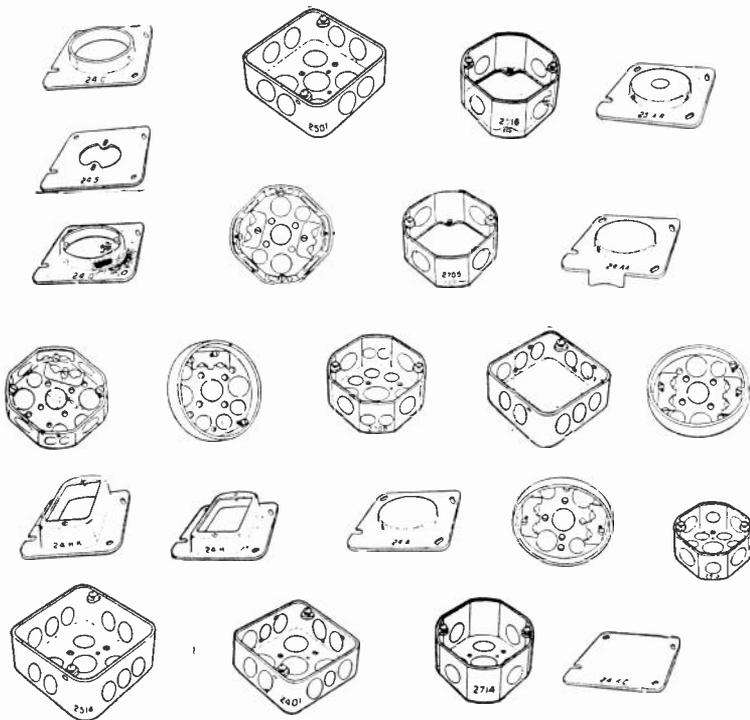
Several types of outlet boxes and covers. Note the arrangement and size of the "knock-out" openings.
